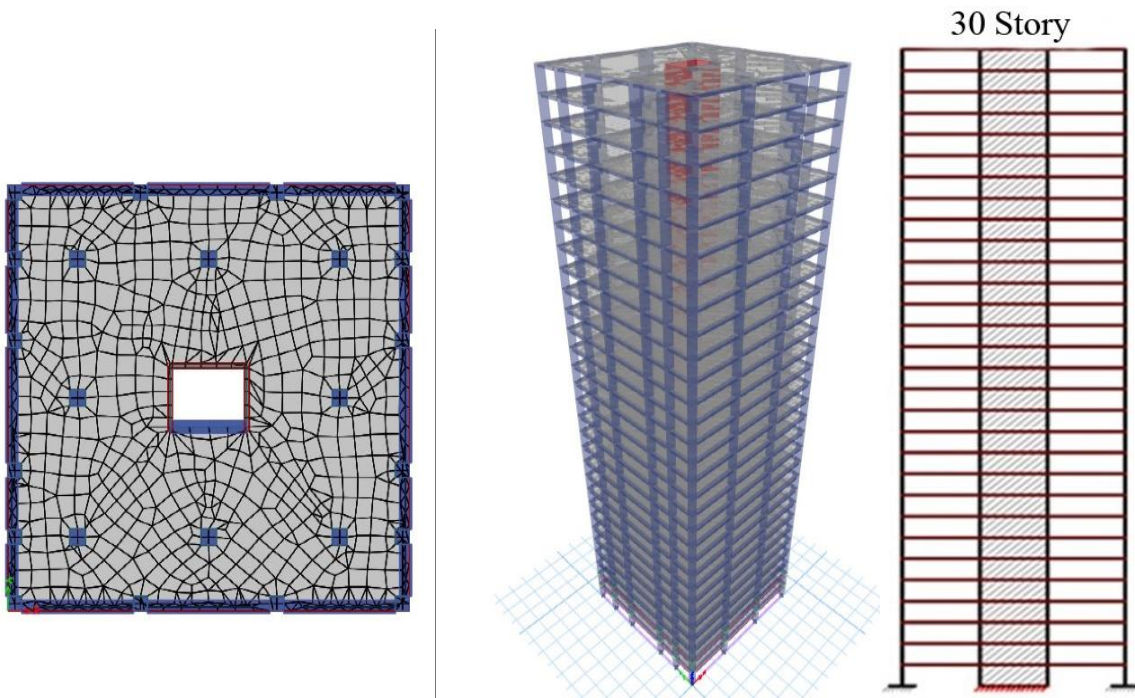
Plan & Vertical Configurations of 3D Square Plan Model of Ordinary
